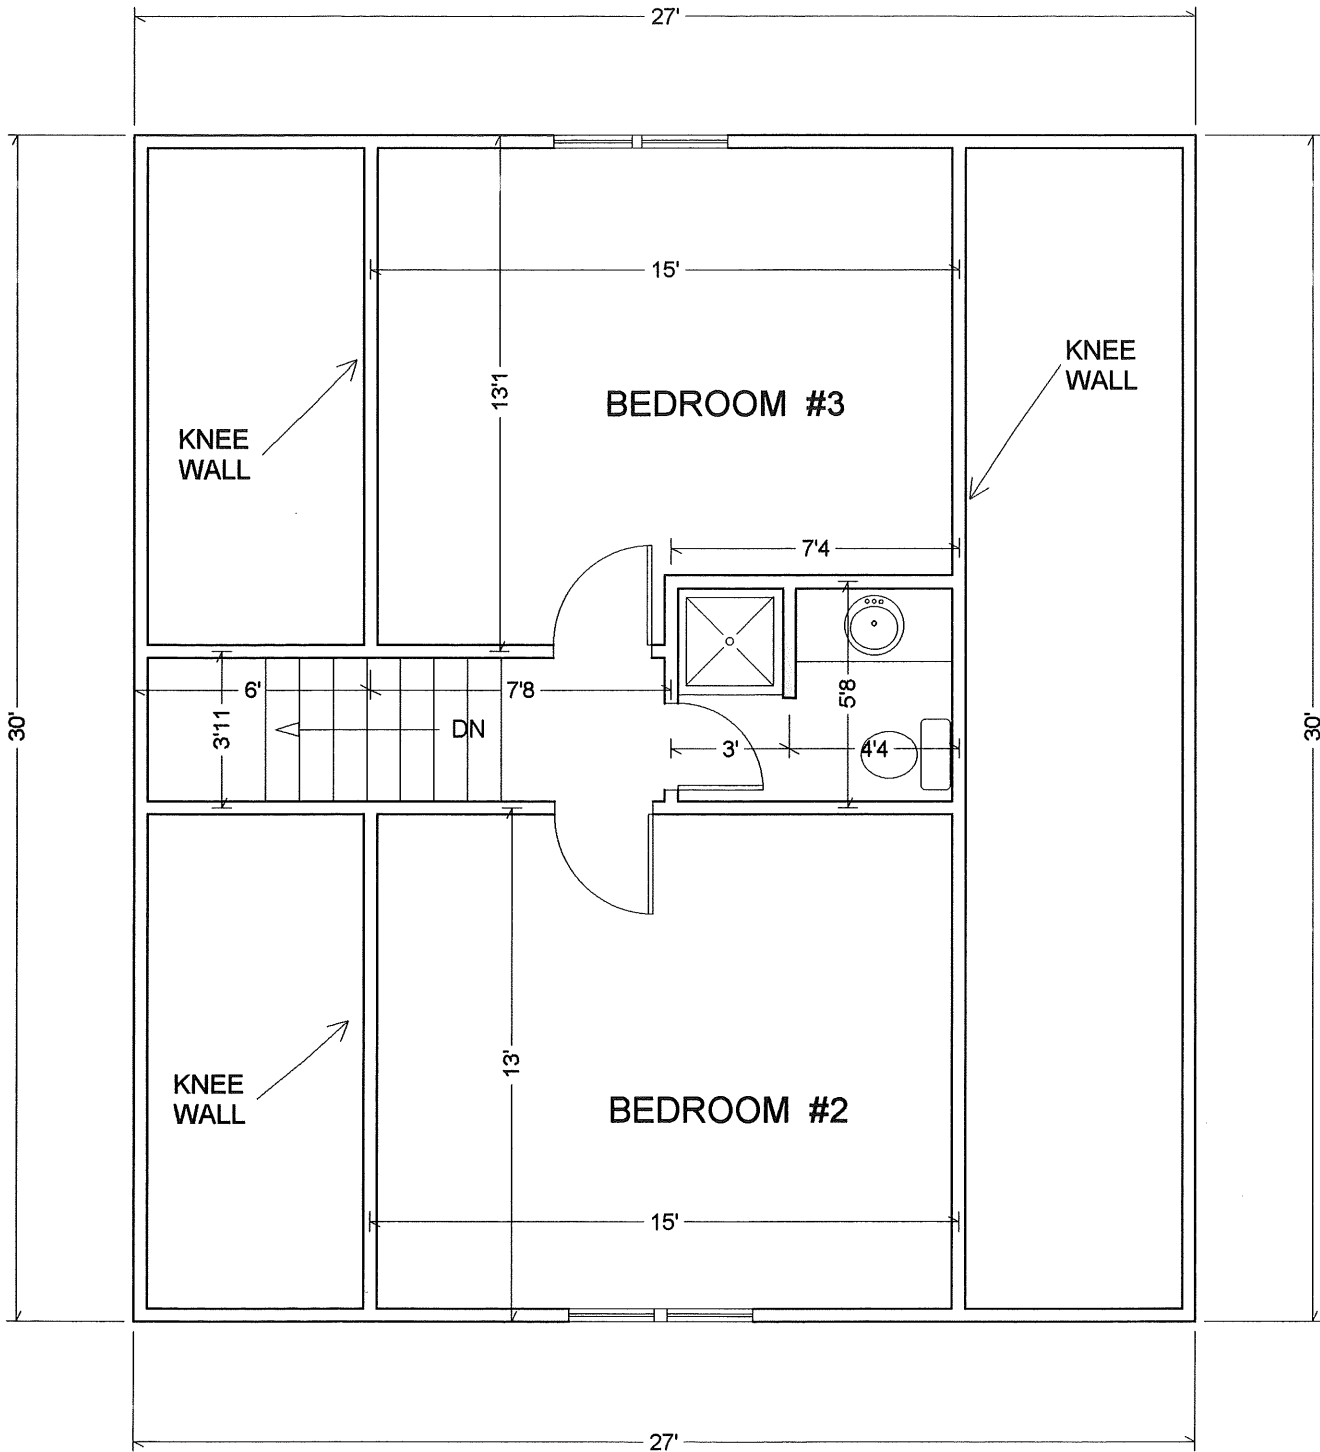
EXHIBIT "F" THIRD FLOOR PLAN "AS PROPOSED"
